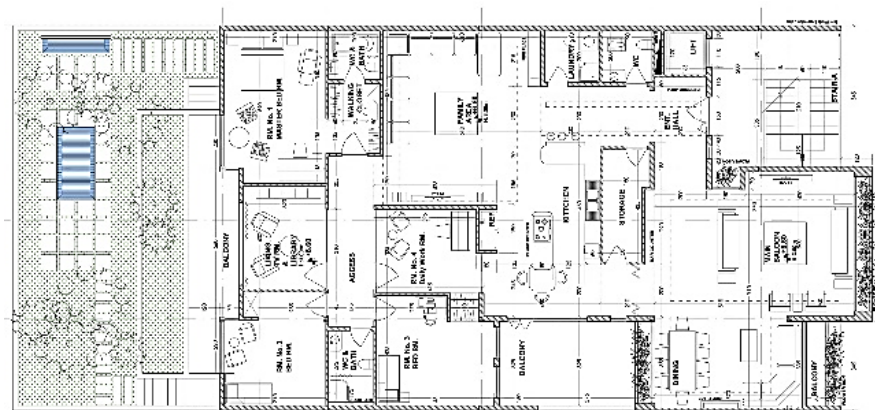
, typical floor plan for residential units at different stories of Mir Hosseini multilevel house by architect Dr. M. Mostafa Zadeh
